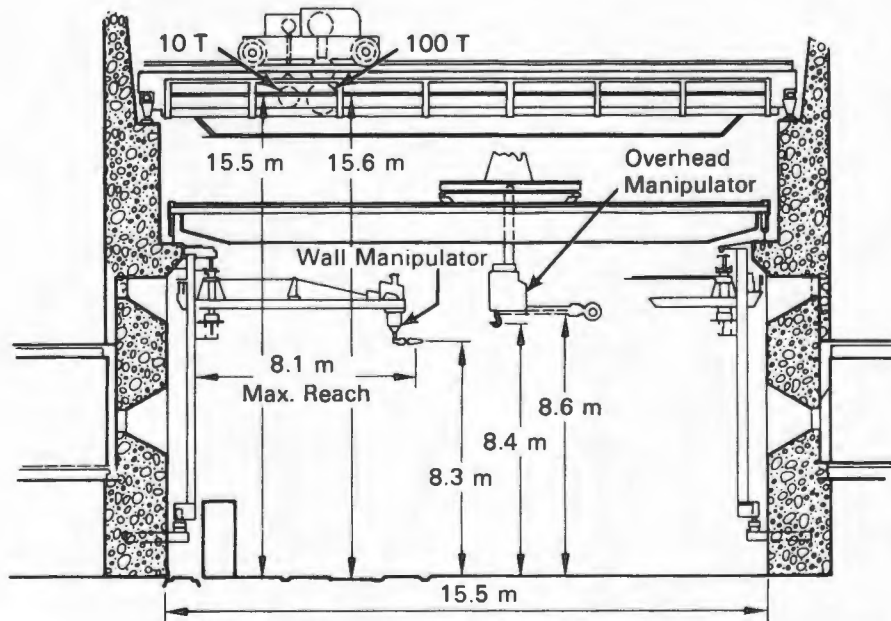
Elevation View of Hot Shop and Handling Equipment
